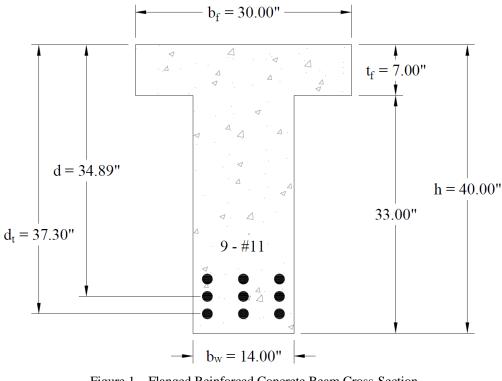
Flanged Reinforced Concrete Beam Cross-Section
